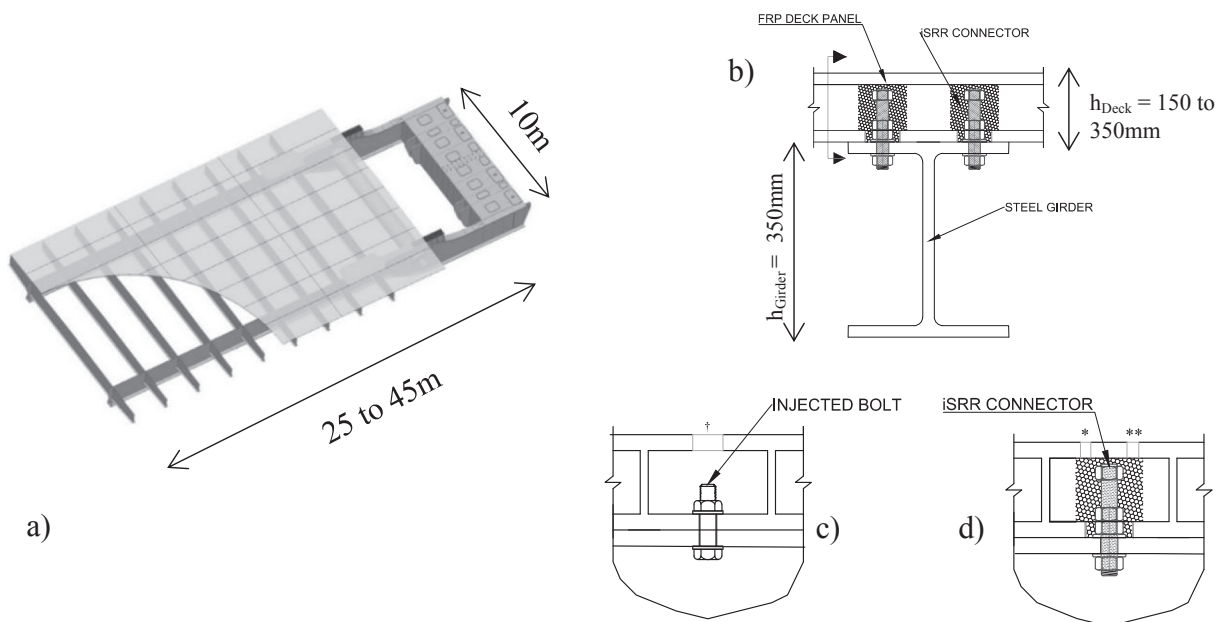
(a) Example of FRP Deck on a movable bridge; (b) illustration of bolted connection between FRP deck panel and steel girder of the bridge; (c) details of conventional injected bolt connection († installation hole); (d) details of iSRR connector (\*air release hole, \*\*resin injection hole).
